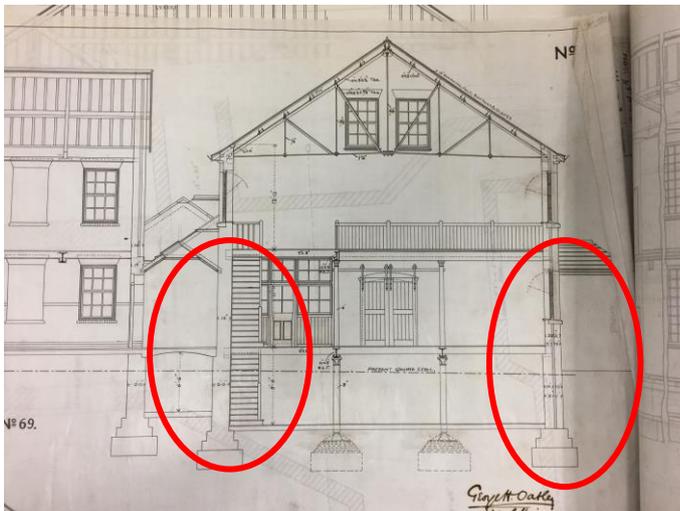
, Showing the differing construction types between the north and south external walls of the stores, source: Author's own 2020
